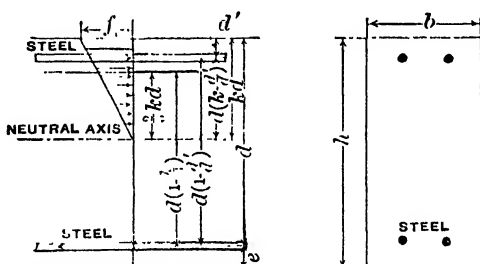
Resisting Forces with Steel in Top and Bottom of Beam. (See p. 427 and p. 757.)
